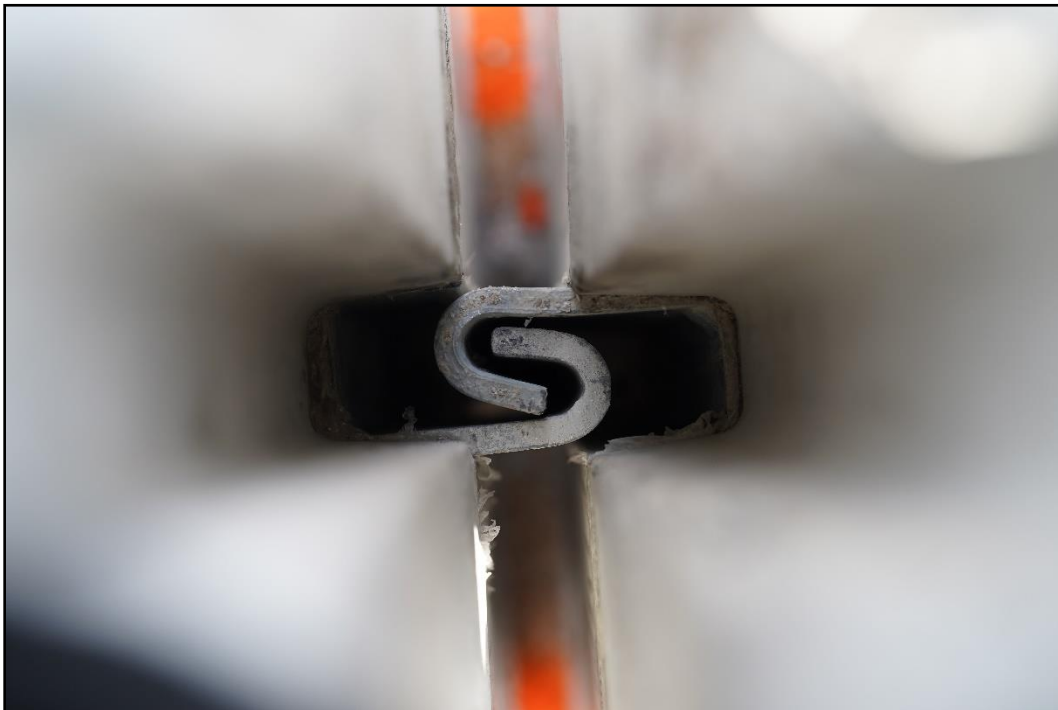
Flared Single-Slope Portable Concrete Barriers Prior to Testing.
